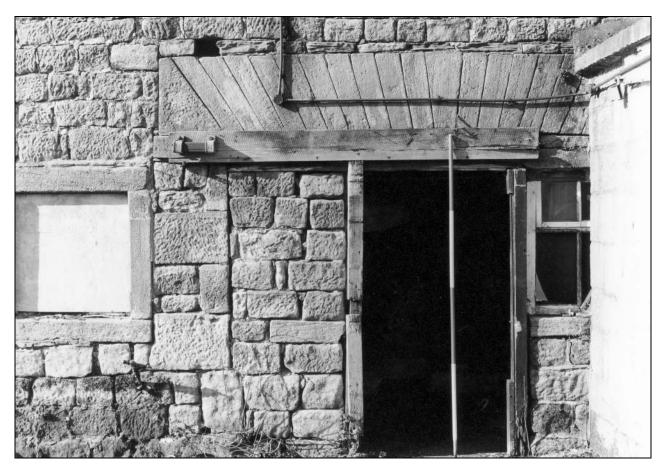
Detail of milking parlour's east entrance (film 5, frame 11)
